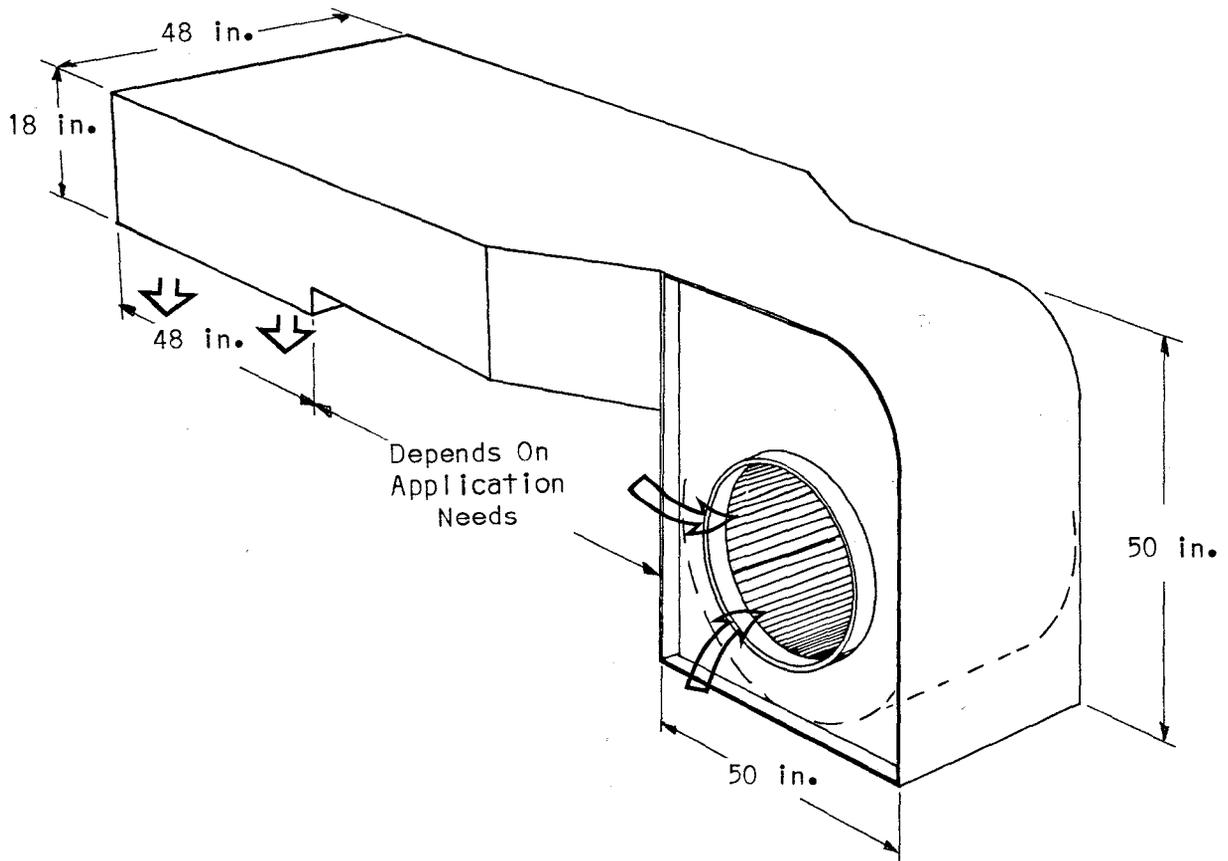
Air Curtain System With Externally/Remote Mounted Fan
